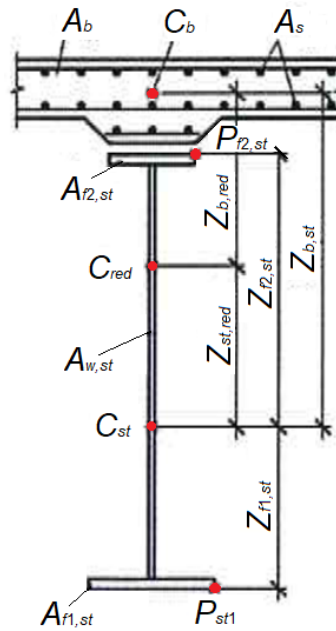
Geometric characteristics of the steel-reinforced concrete beam section:
